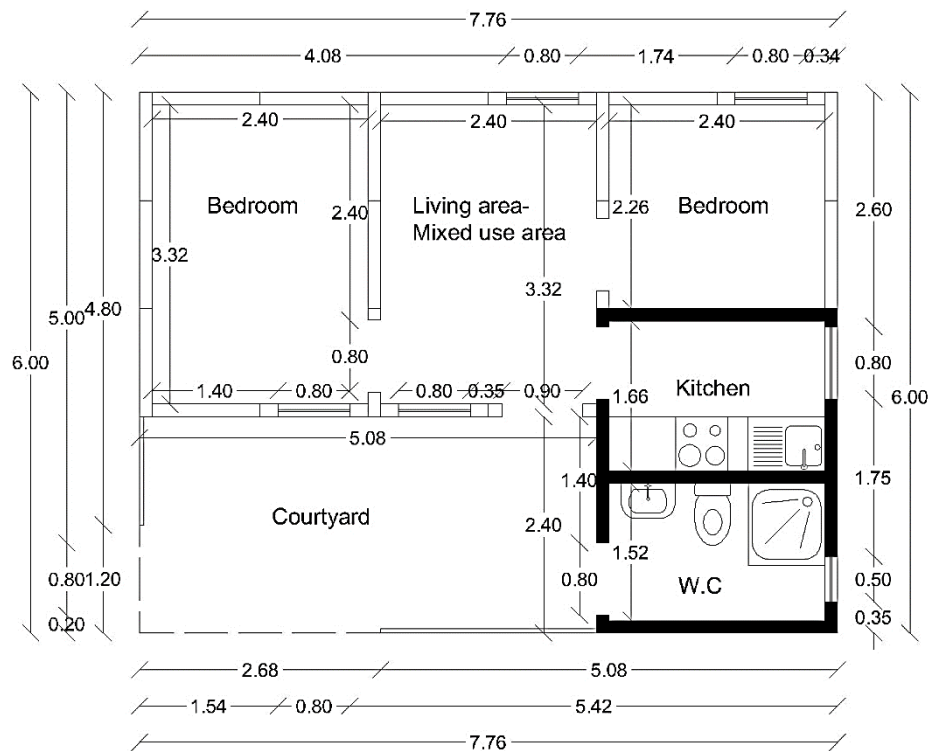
Final shelter outline proposal- basic plan for a family of six
